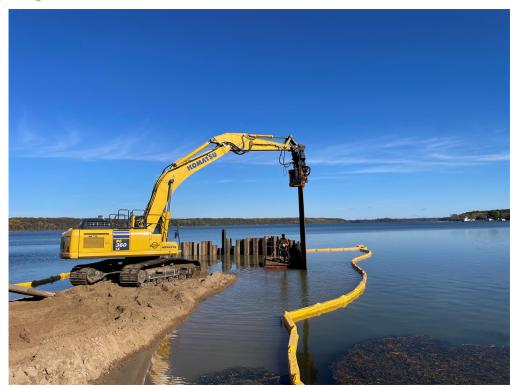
Sheet pile installation started along right side of causeway - Oct 17, 2023, 1:36 PM
